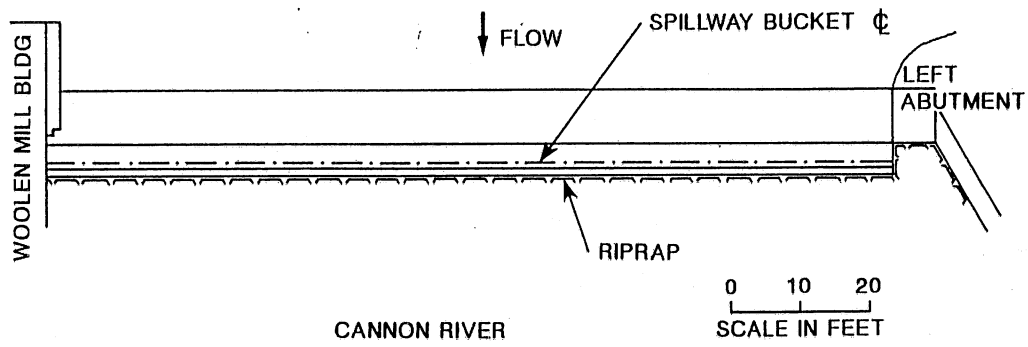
Plan of Faribault Woolen Mill south fixed crest gravity spillway.
